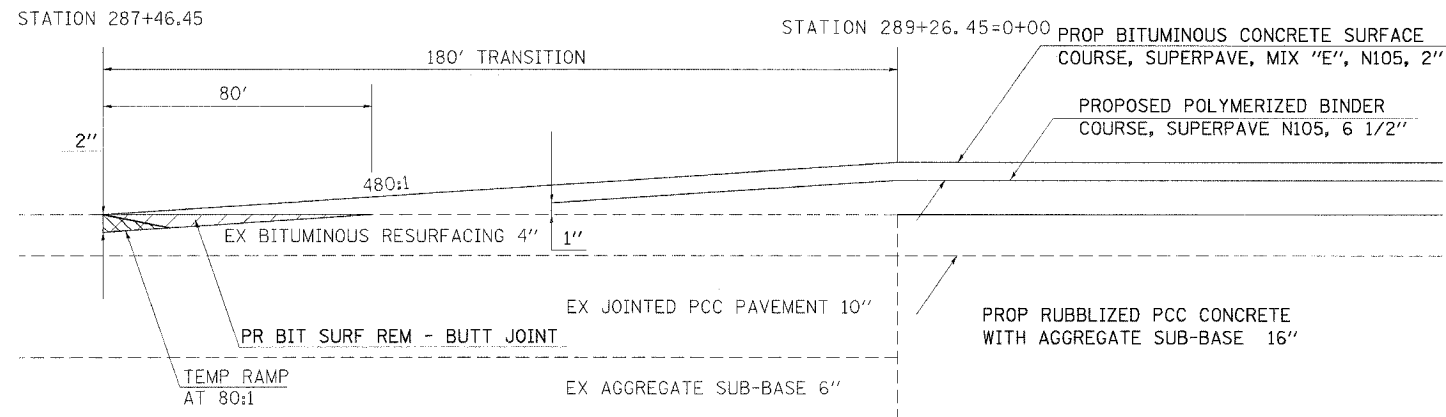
DETAIL OF MEDIAN CROSSOVER CROSS SECTIONAL VIEW
